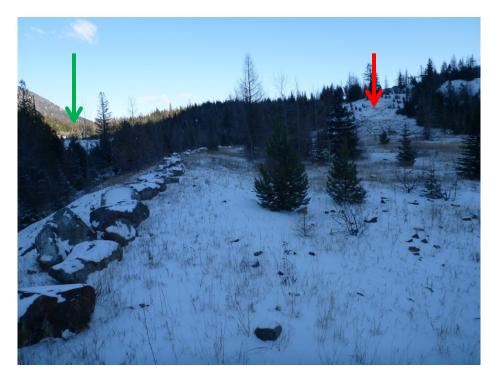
Good Friday crest of West Limb of dam. Photo taken facing north. Red arrow indicates reclaimed hillside tailings pile. Green arrow indicates location of Jumbo dam.
